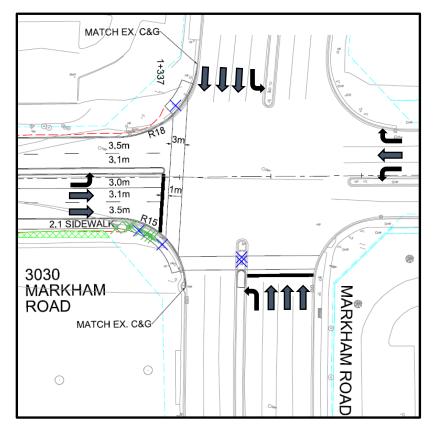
Passmore Avenue and Markham Road Proposed Intersection Layout
